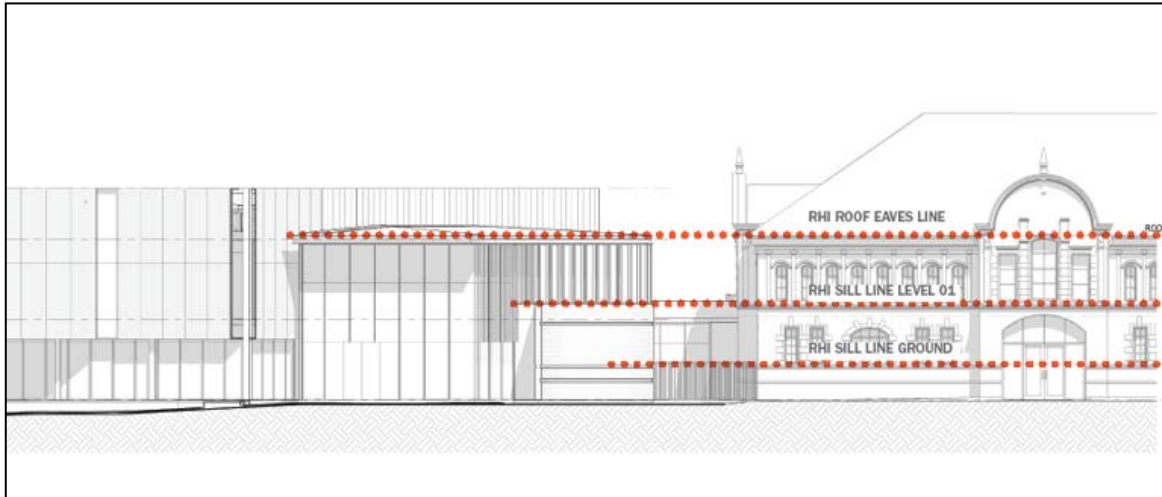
| East elevation showing roof heights corresponding with sill and eave lines of the RHI (Source: Applicant's RRFI).
